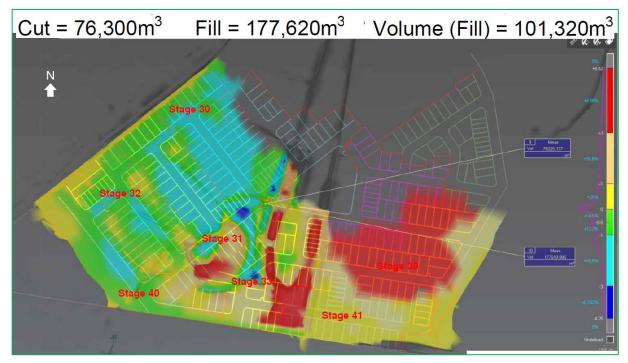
North Harbour Phase 4B Showing Bulk Earthwork and Layout Plan
